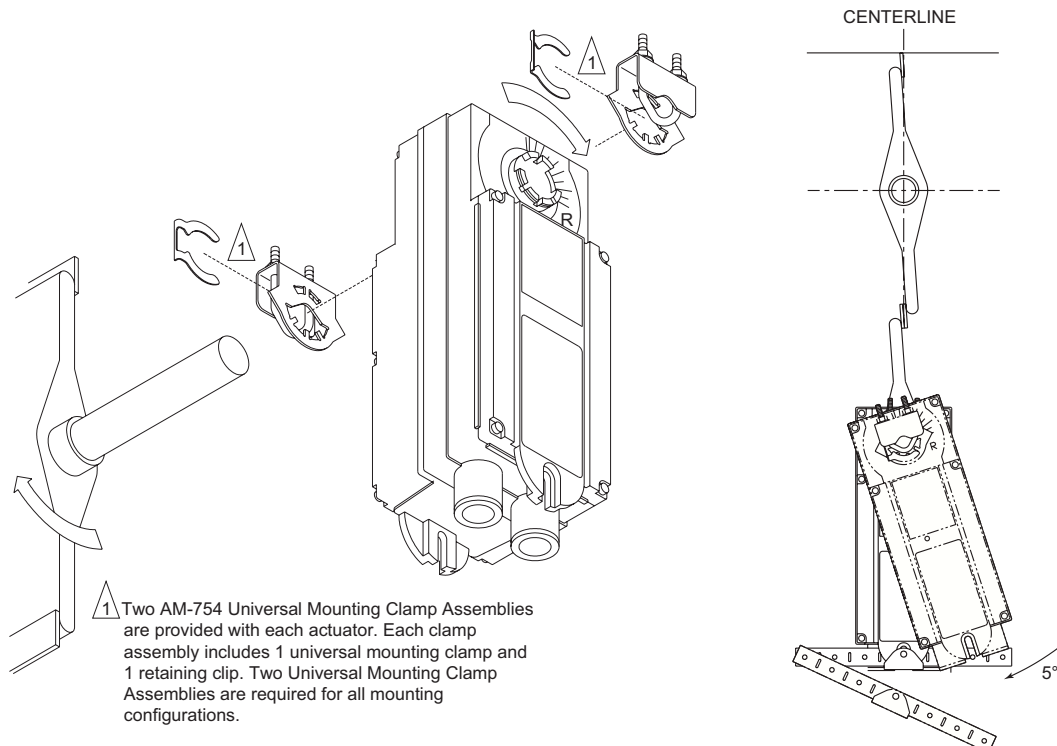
Long Damper Shaft Mounting and Actuator Parts Identification, Actuator Rotation Clockwise to Closed.
